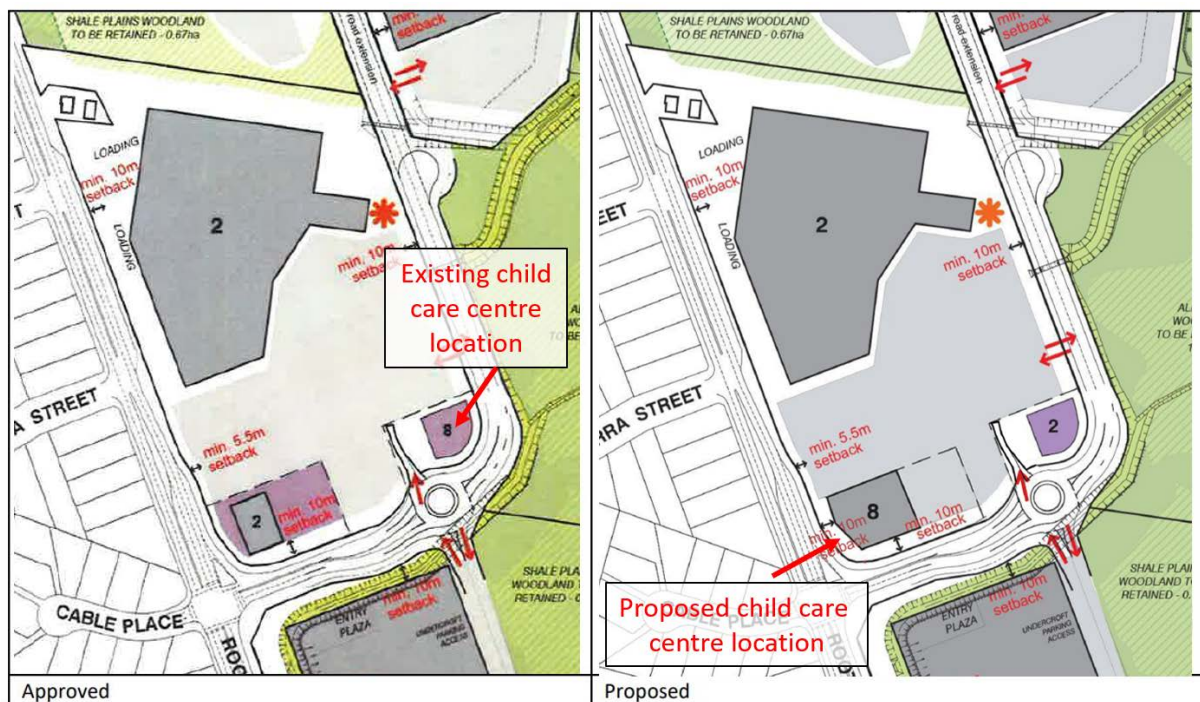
| Approved concept plan (left) and proposed (right) concept plan (Source: Applicant's SEE)
